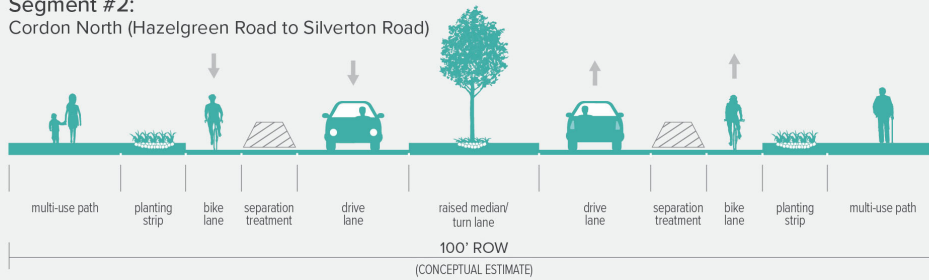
ALTERNATIVE #1 & #2 CROSS-SECTIONS
